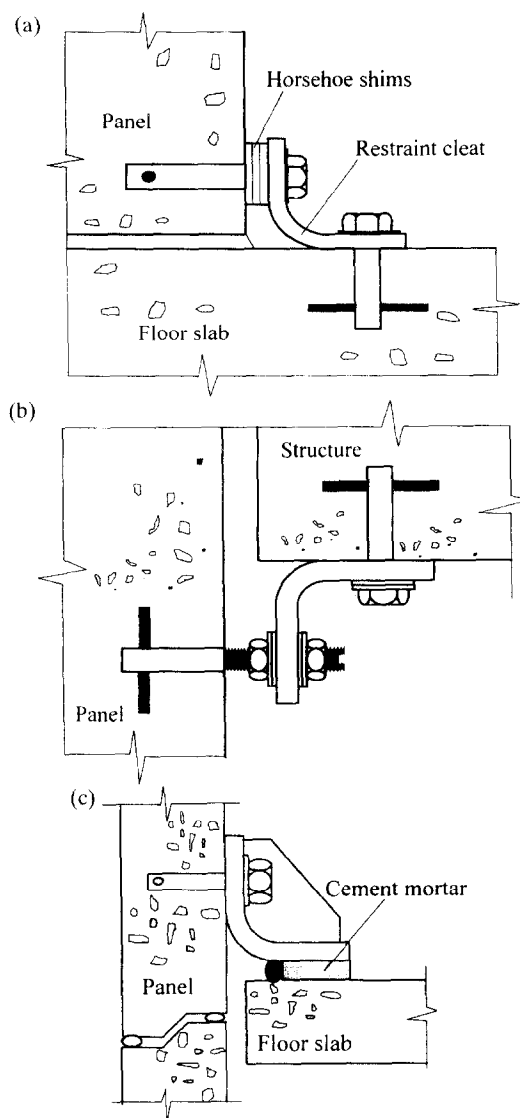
Typical drawings of fixings for reinforced concrete cladding panels: (a) typical restraint fixing at bottom of panel, (b) typical restraint fixing at head of panel, and (c) typical loadbearing fixing.
